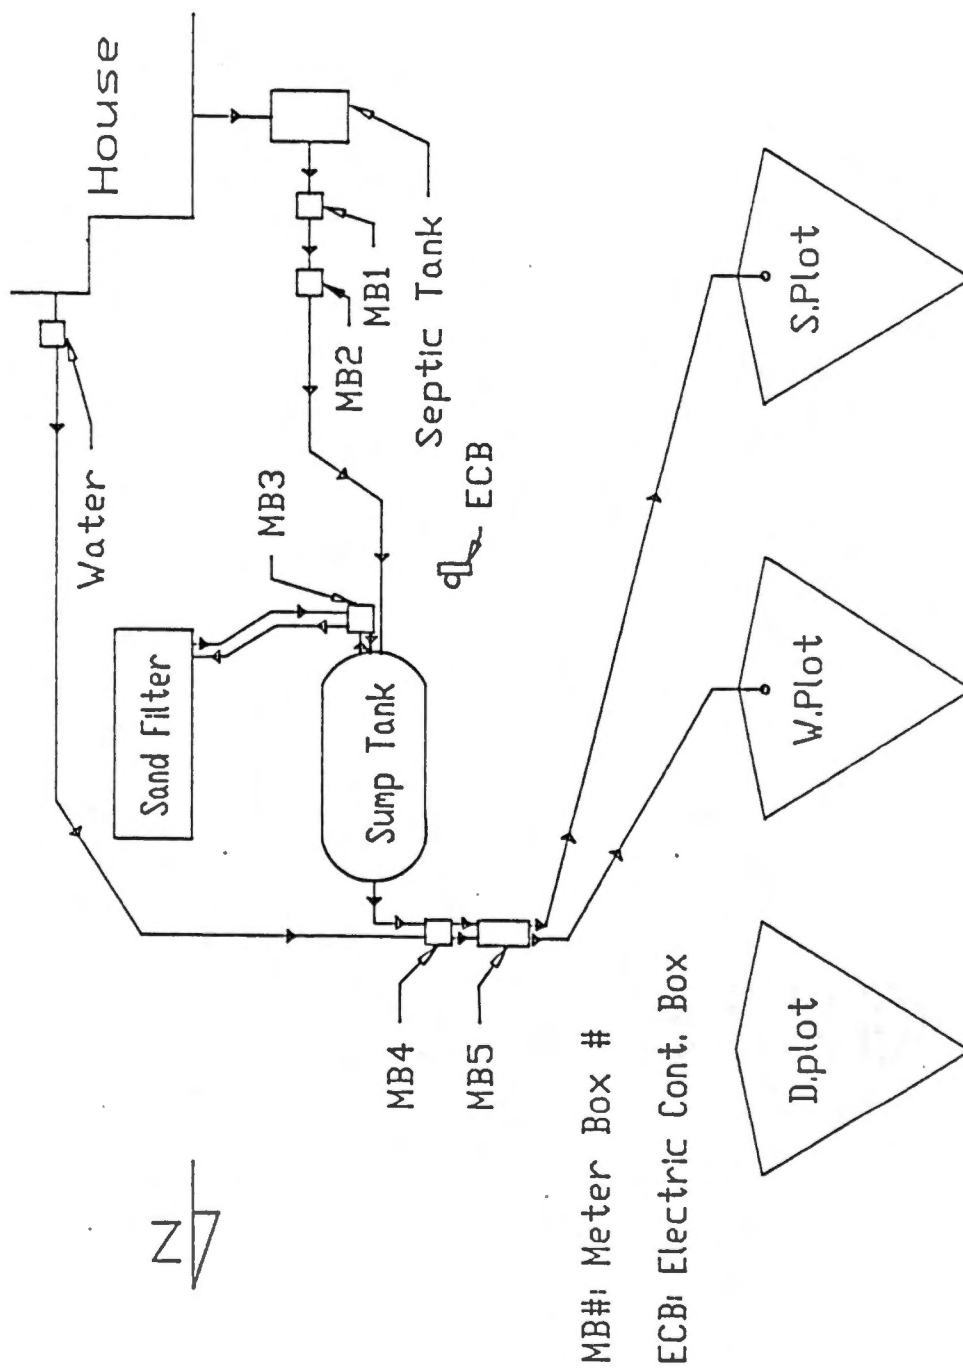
Recirculating Sand Filter Prototype System Layout.
